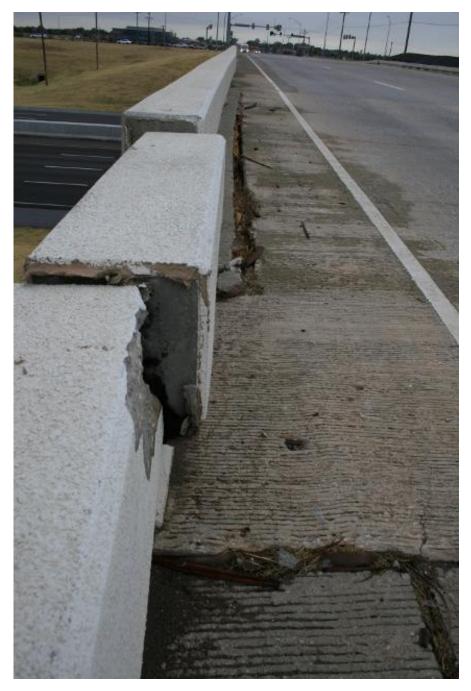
Horizontal Displacement; Looking West Across Tecumseh Road Bridge
